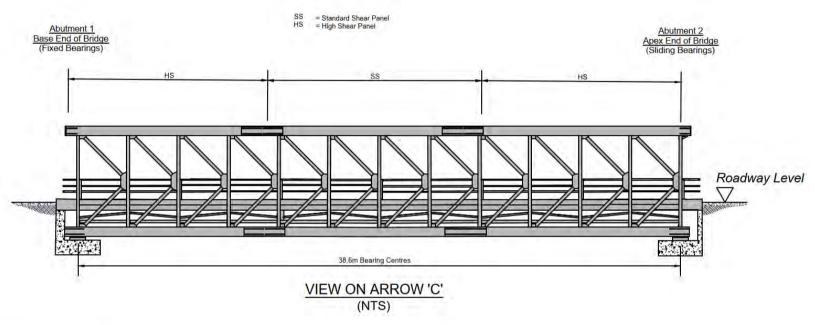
Long Sections of Temporary Bridge Structure⁷
